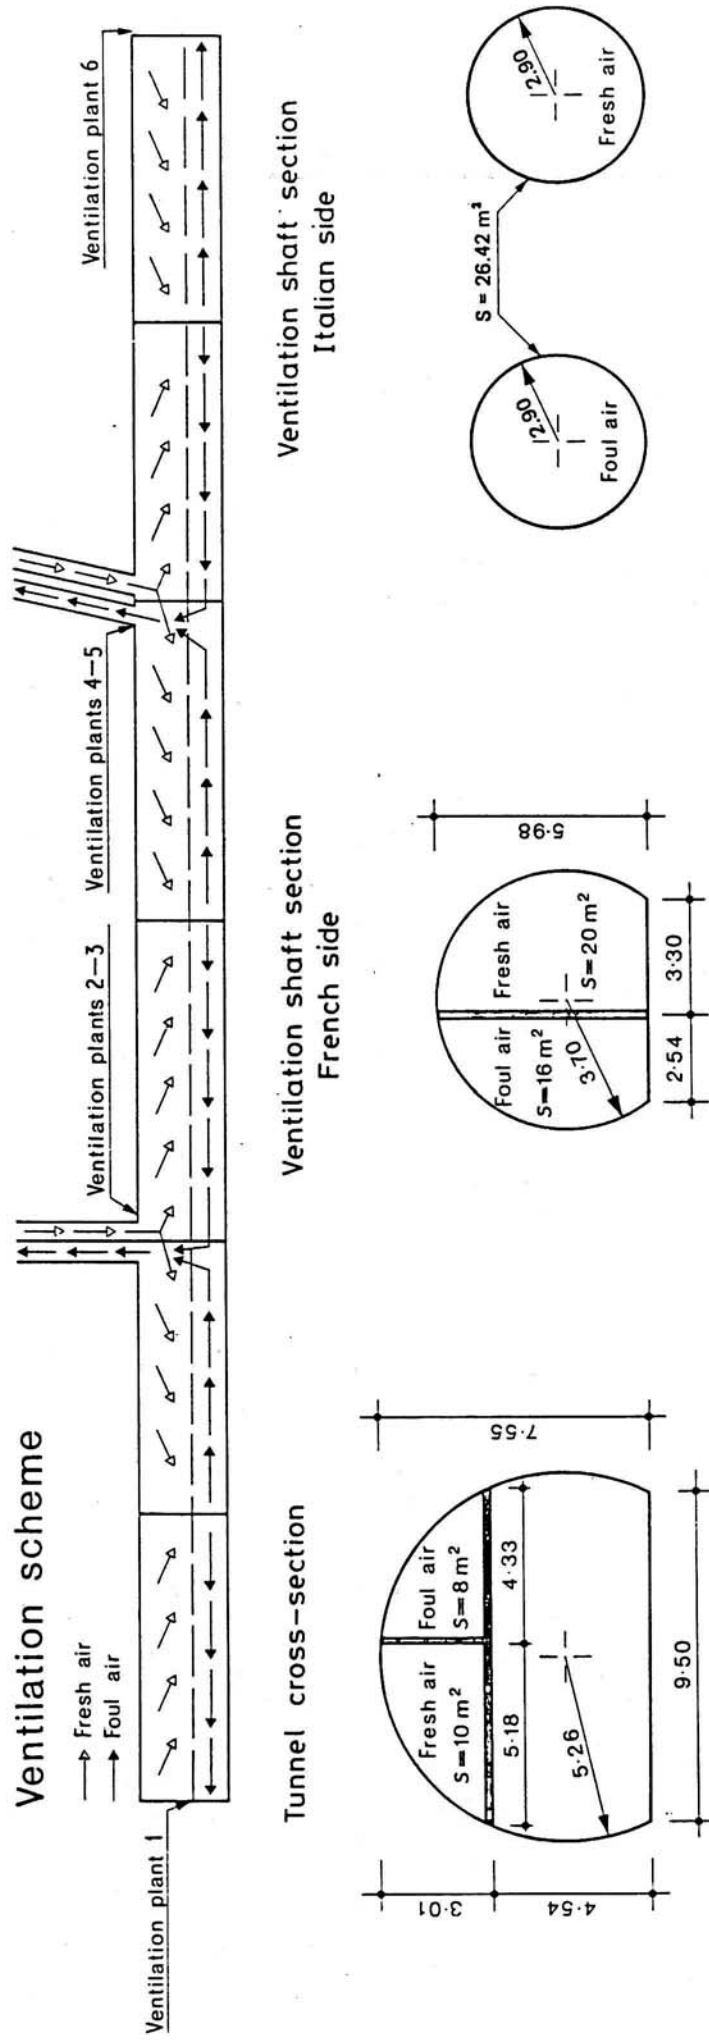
Profile, layout and ventilation scheme for Fréjus motorway tunnel
